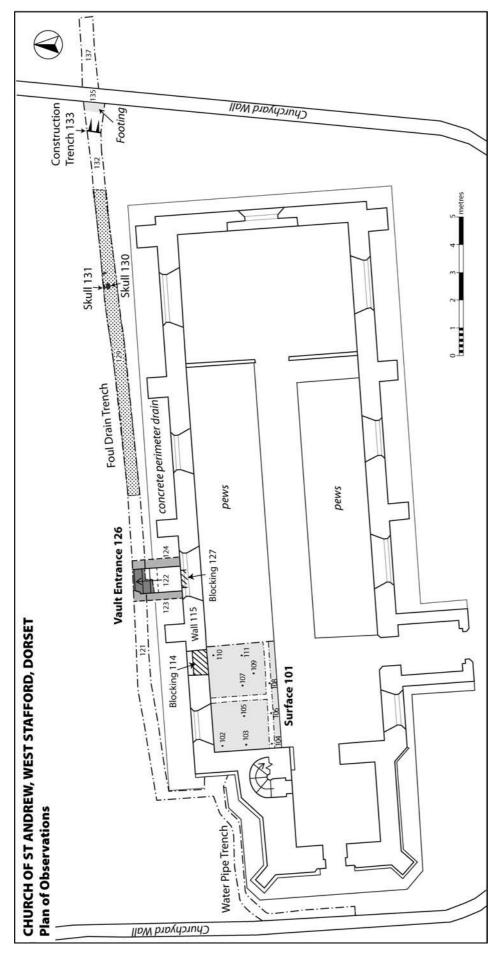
Plan of Observations (The church plan is schematic and does not show all architectural details).
